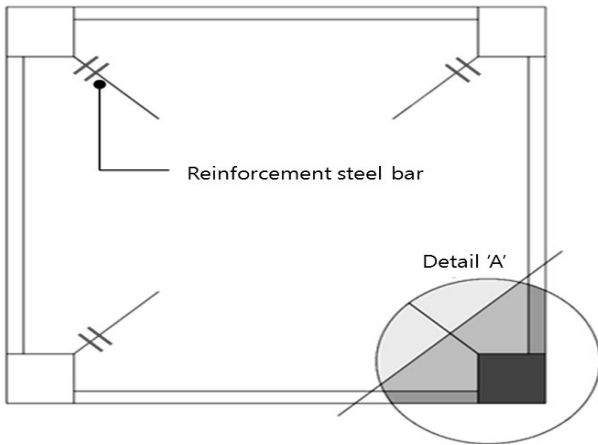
Causes of the crack at the edge of concrete slab (Column)
